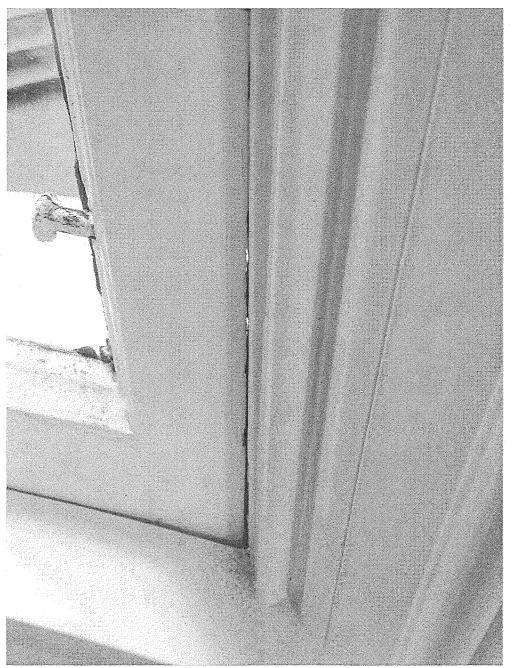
Detail of first floor window from interior showing gap at edge of sash where light is coming through.
